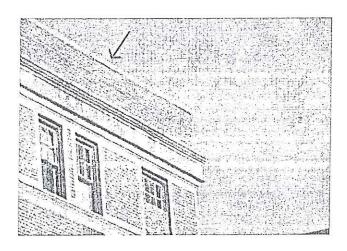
Displaced and spalled coping stone (arrow) at the north end of parapet at east façade of Nelson House Annex.
